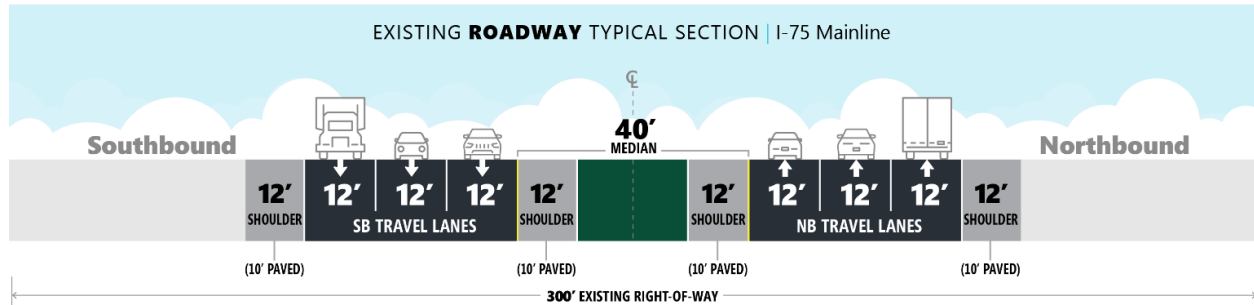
| Existing I-75 Typical Section – S.R. 200 to S.R. 326
